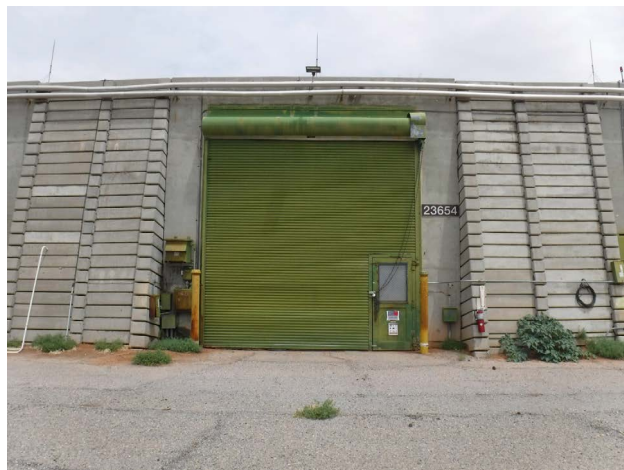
Property 23654, middle bay entrance area on south elevation, view to the north.
